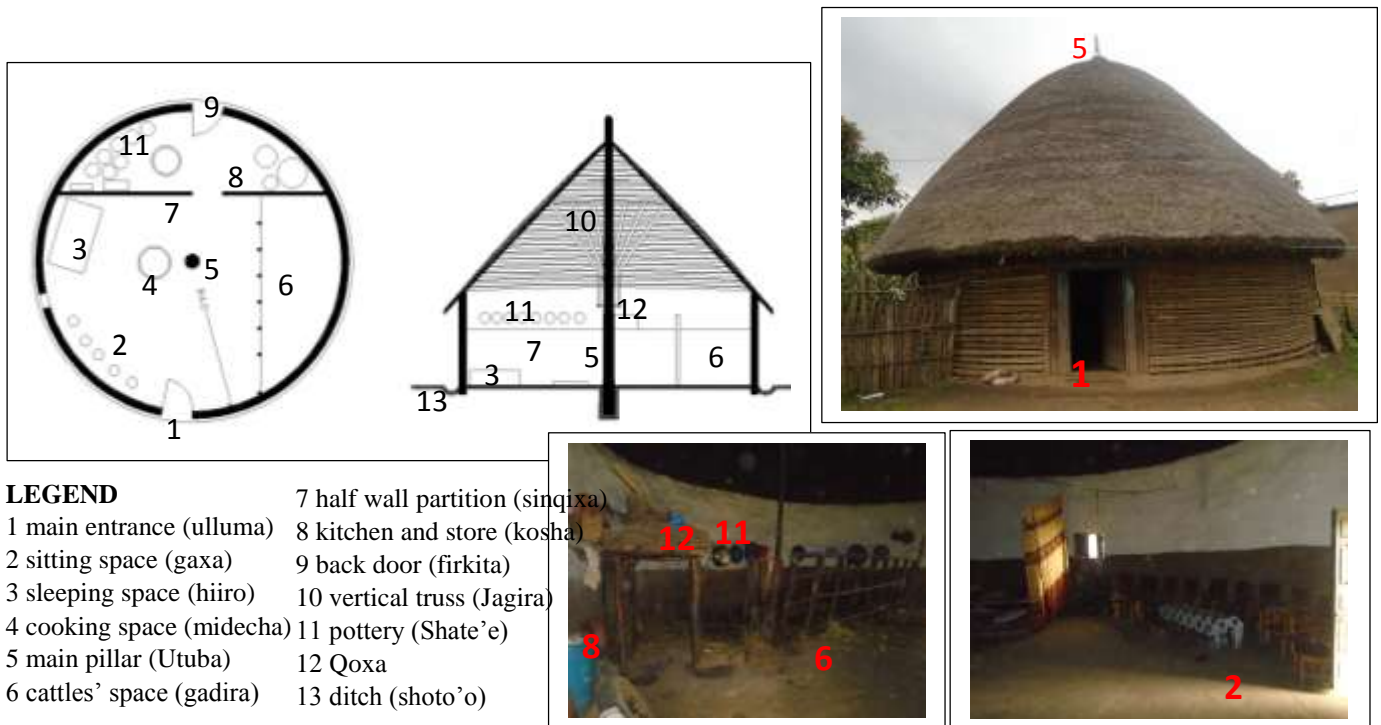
Hadiya typical traditional main house "Goye'e" plan, section and pic
